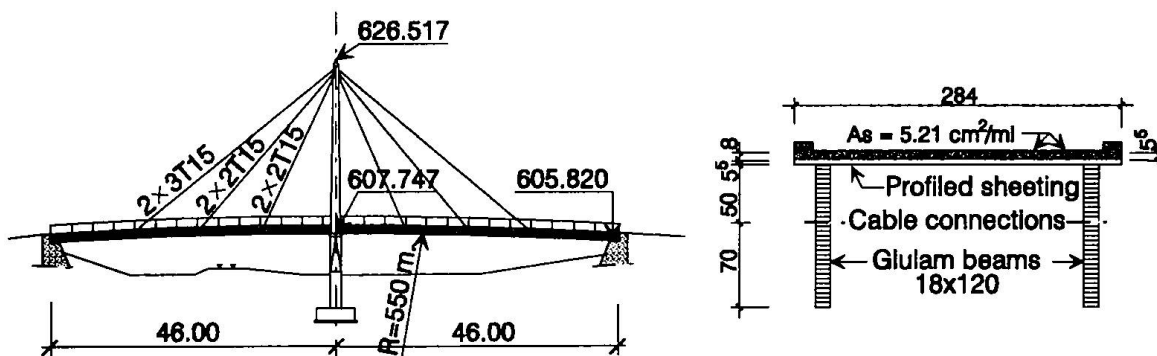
Cable-stayed footbridge, general layout and cross-section of the deck
